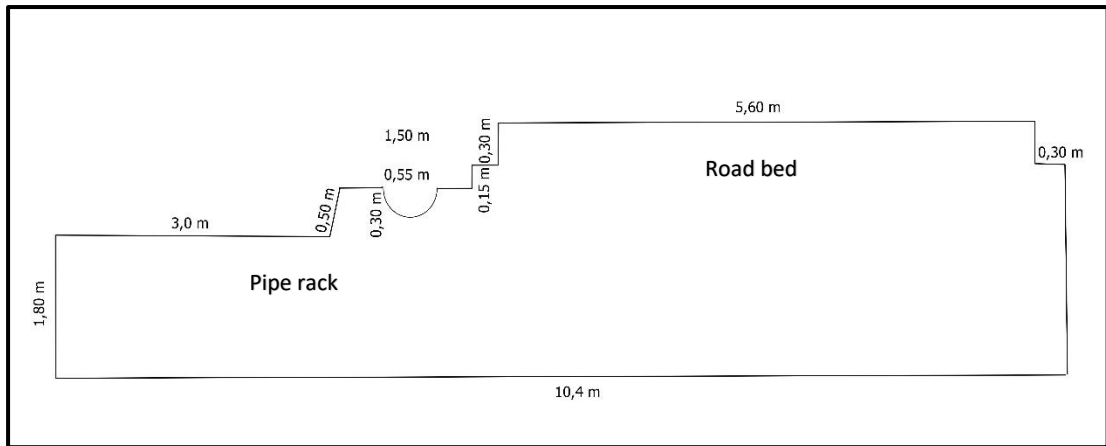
Profile sketch of the bridge structure showing the more important measurements (It should be remembered that when the bridge was originally built, the measurements would have been according to the Imperial Standards of Measurements)
